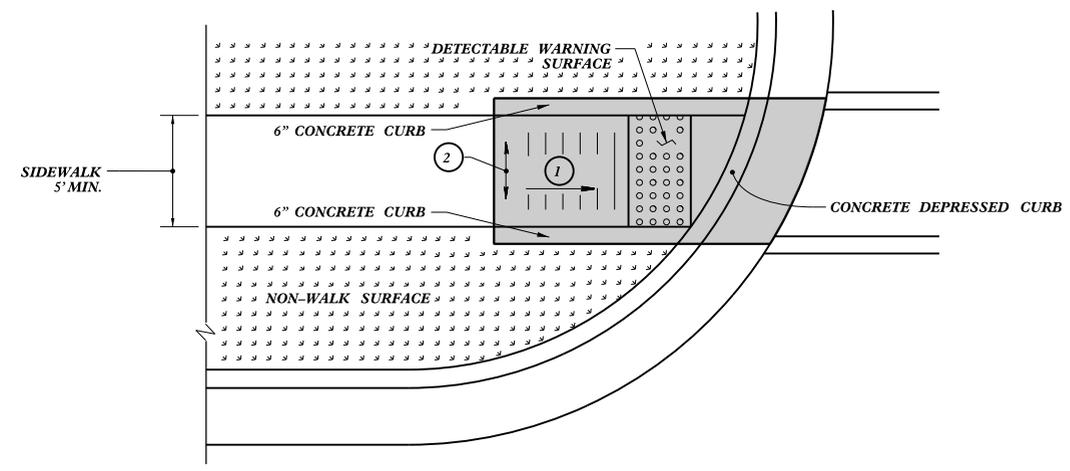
DETAIL SHOWING TYPICAL LOCATION OF CURB
